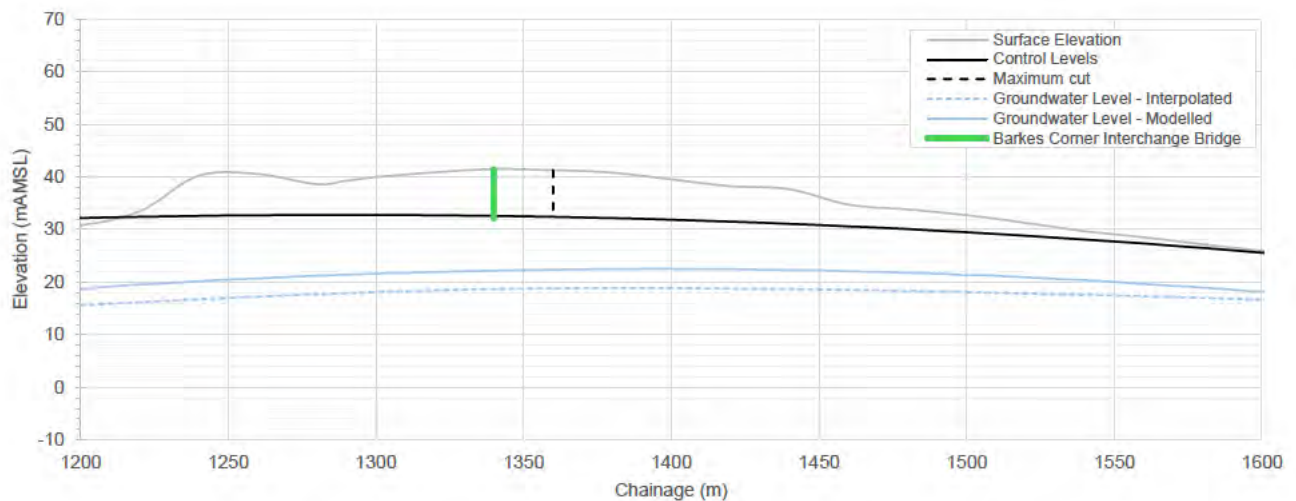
Long section along 1200 to 1600 m (SH29A_Cut 2 and Barks Corner Interchange Bridge).
